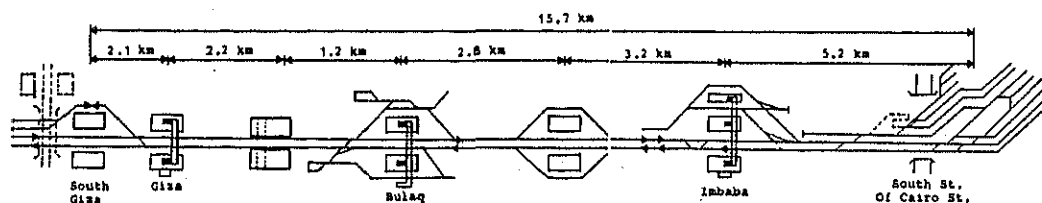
Track Layout Plan for ENR Commuter Service
